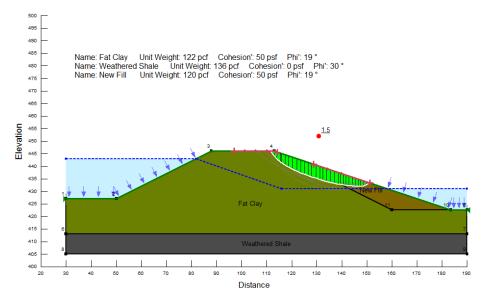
ALTERNATIVE 3 - SLOPE MODIFIED TO 3H:1V
